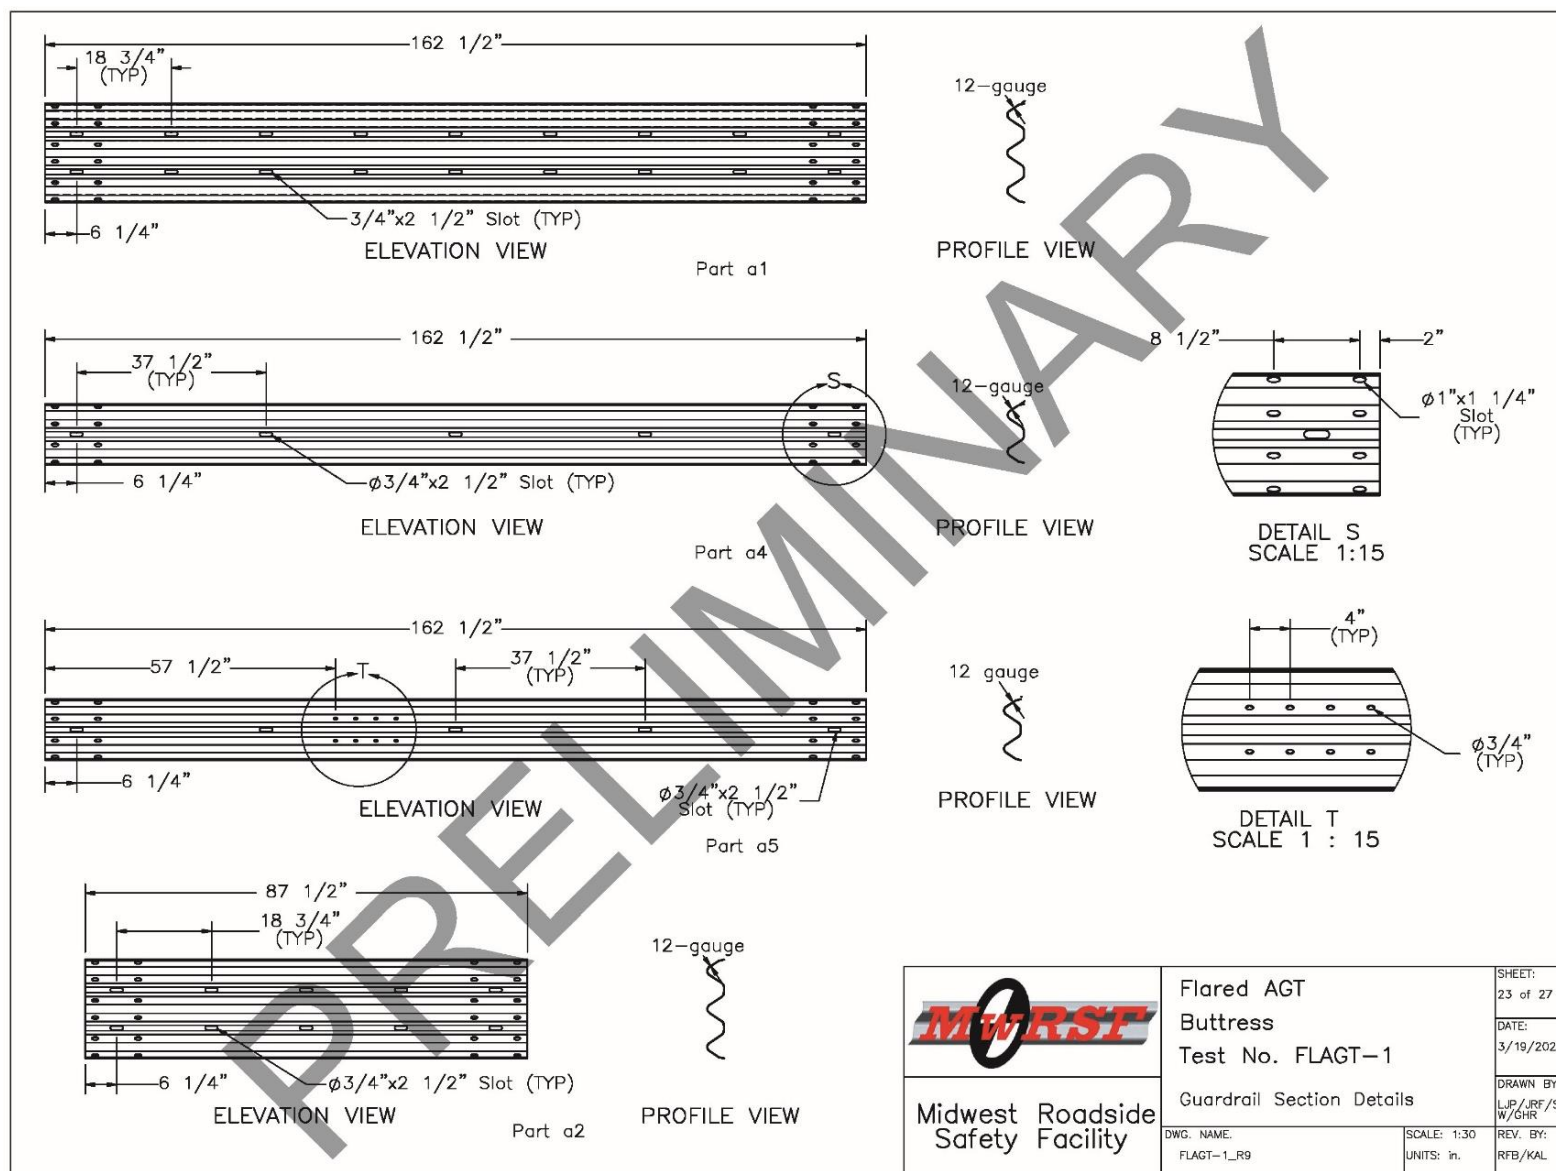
Guardrail Section Details, Test No. FLAGT-1
